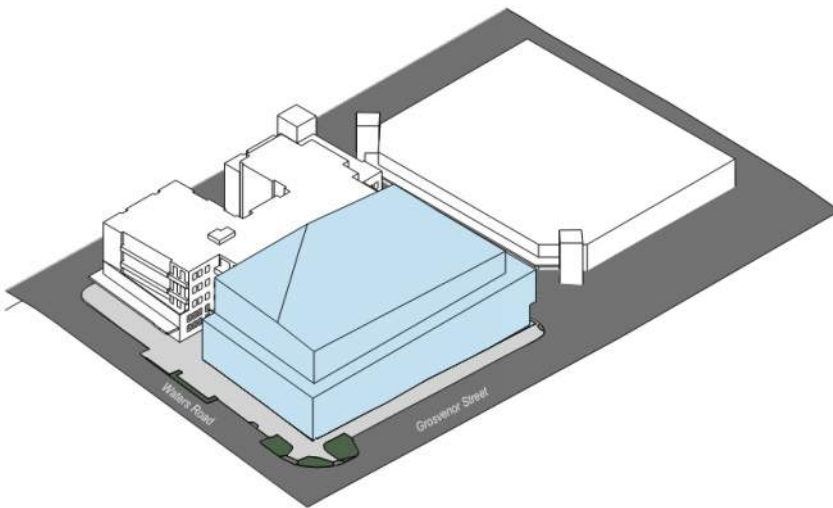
Permitted Building Envelope looking south-west (source: SJB Architects)
